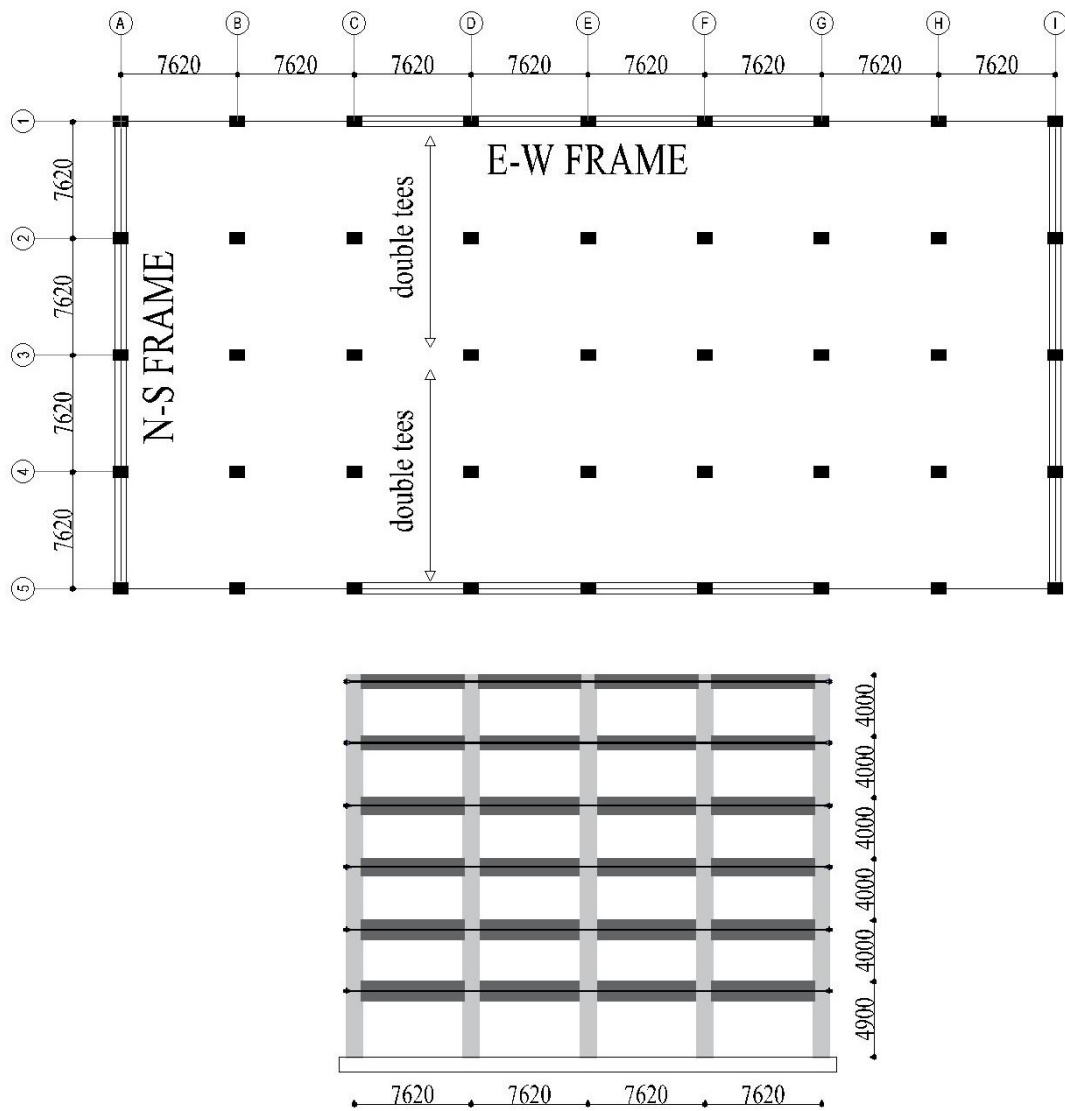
Plan of the prototype building and section of the analyzed frame.
